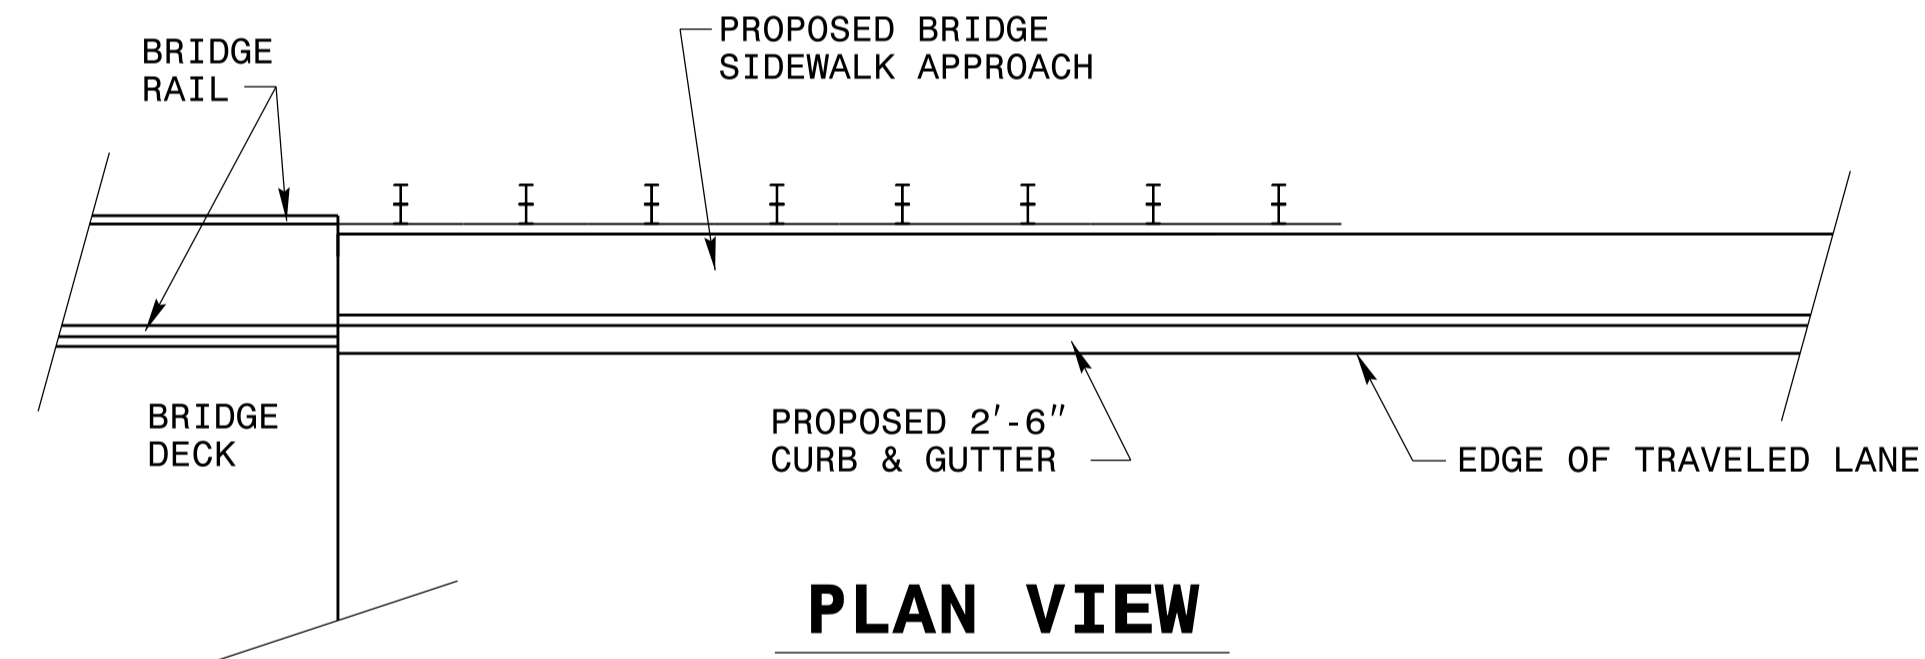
DETAIL OF PROPOSED CONCRETE BRIDGE SIDEWALK APPROACH
